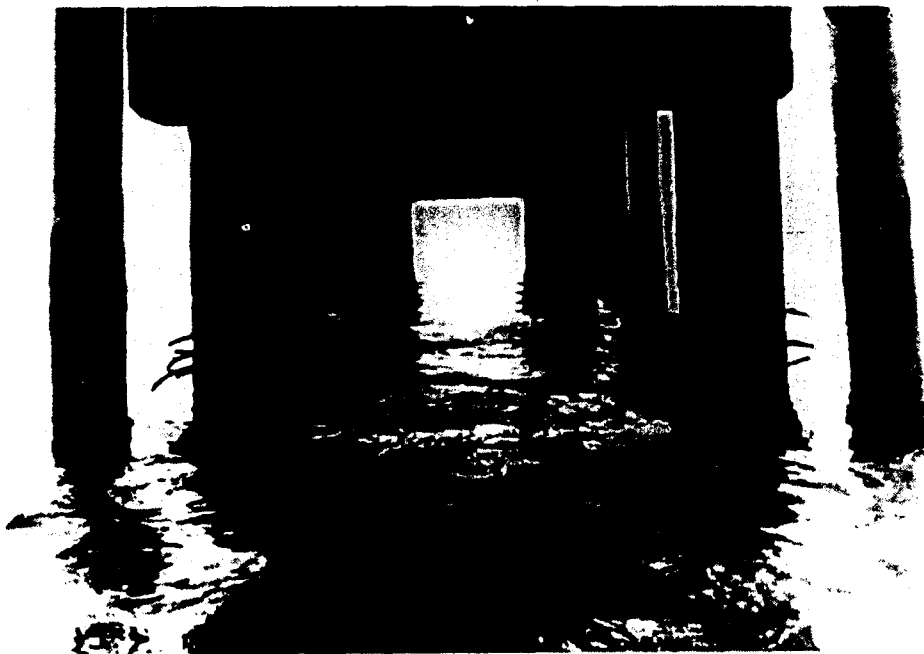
Attachment of all specimens at mean waterline to concrete piling beneath pier at long-term exposure site, Miami, FL
